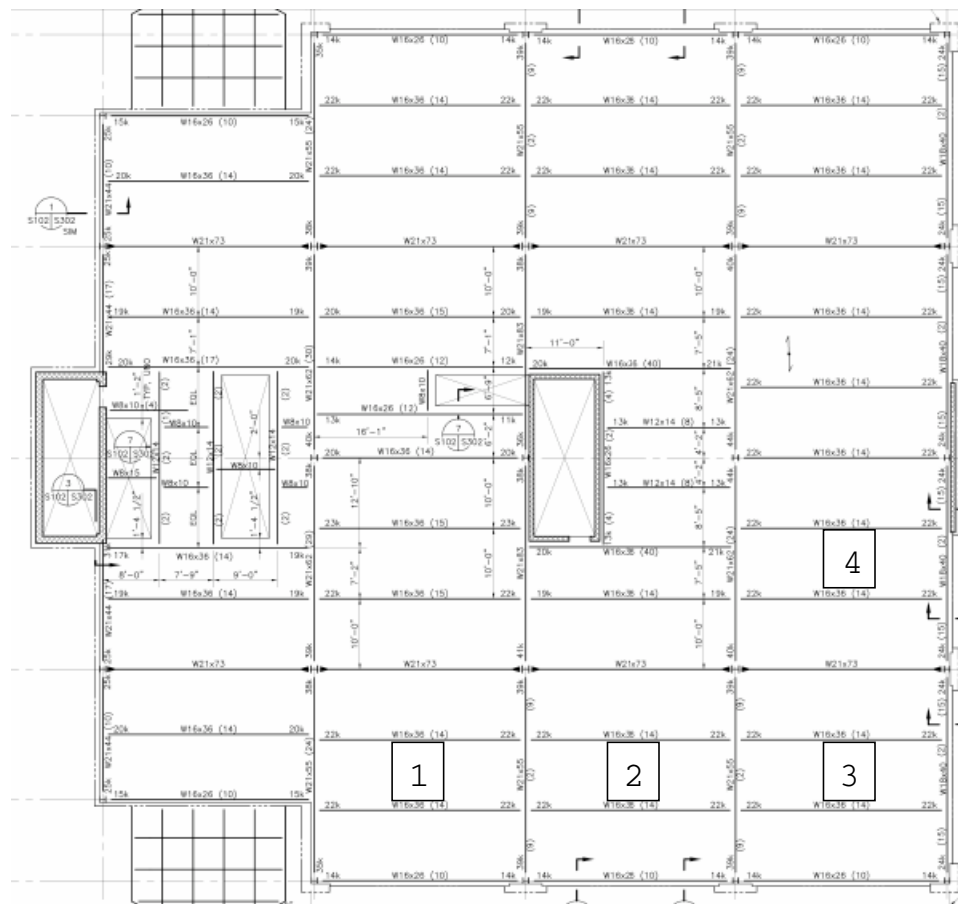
2nd Floor Framing Plan, Including Tested Bay Numbers
